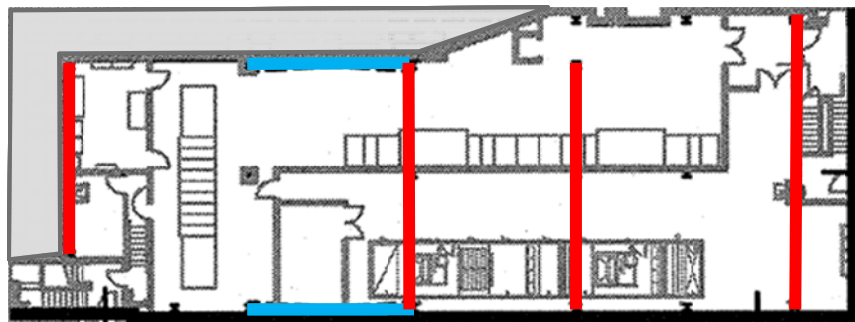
Floor plans showing braced (blue) and moment (red) frames locations in the central plant). (Courtesy of EwingCole)
